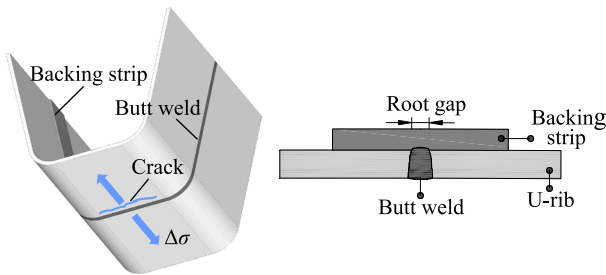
U-rib butt-welded joint with backing strip.
